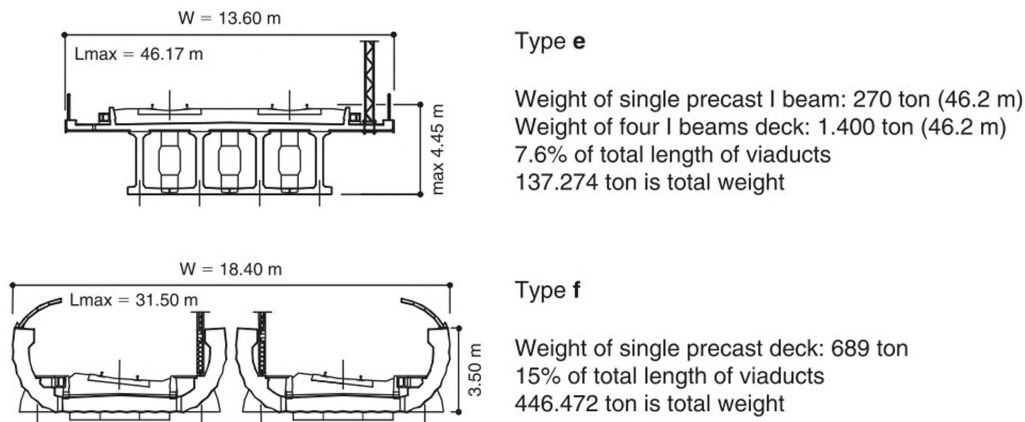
Four precast I beams and cast in situ slab (e) and Lower way U deck (f).
